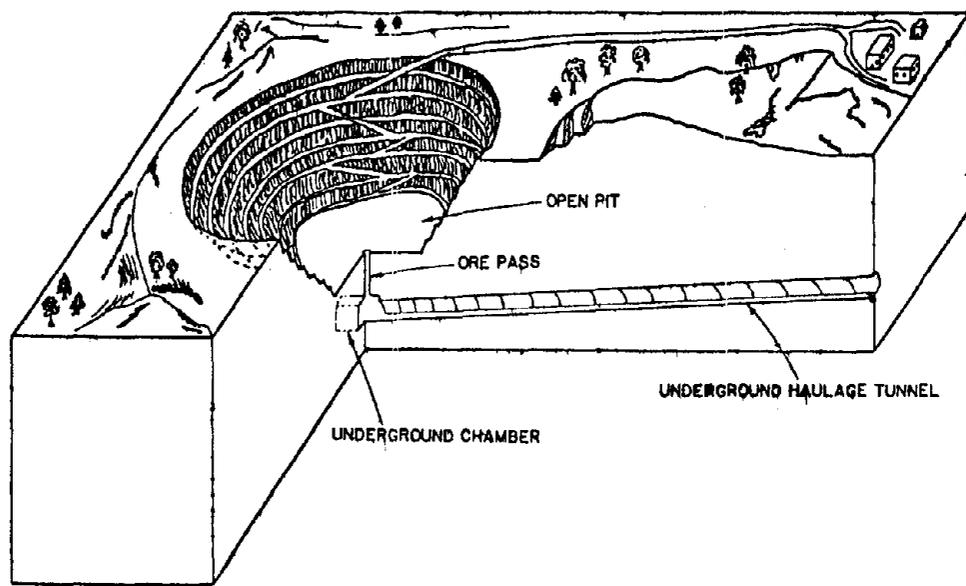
Open pit with an ore pass and tunnel haulage system (idealized)
